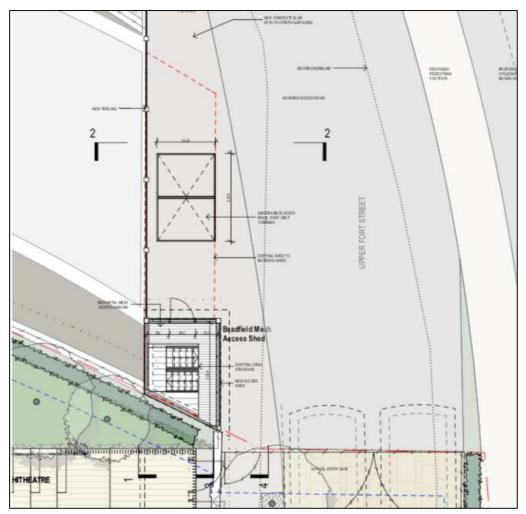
Proposed Plan of Services Building modifications. (Source: FJMT, DA-5003, 18.12.19)
